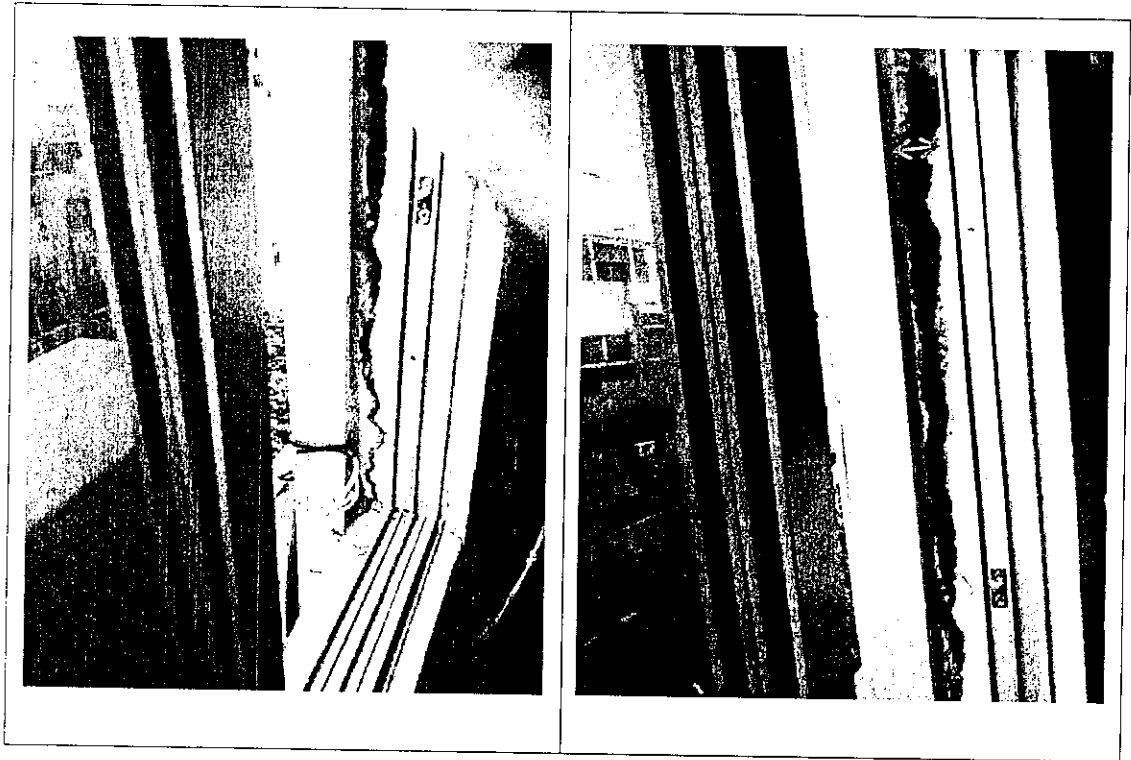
Spalling and "void" between the outer shell part and the interior core in WW
